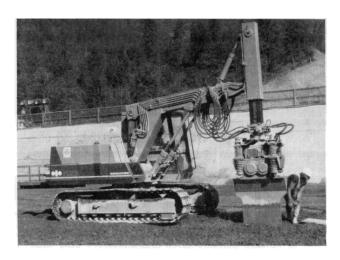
Contract joint placement using a vibrating blade to insert galvanized steel sheeting
